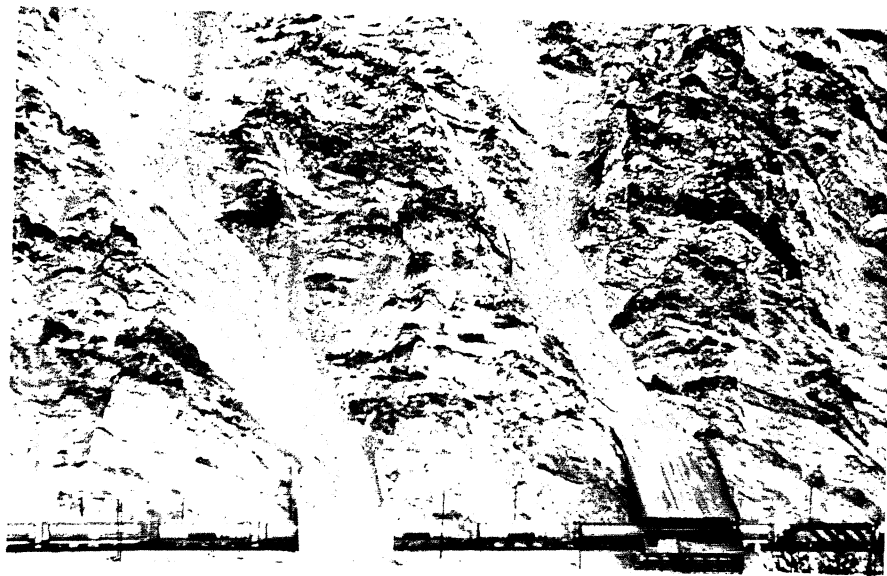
Rock sheds located at Mile 94.4 Ashcroft Subdivision
